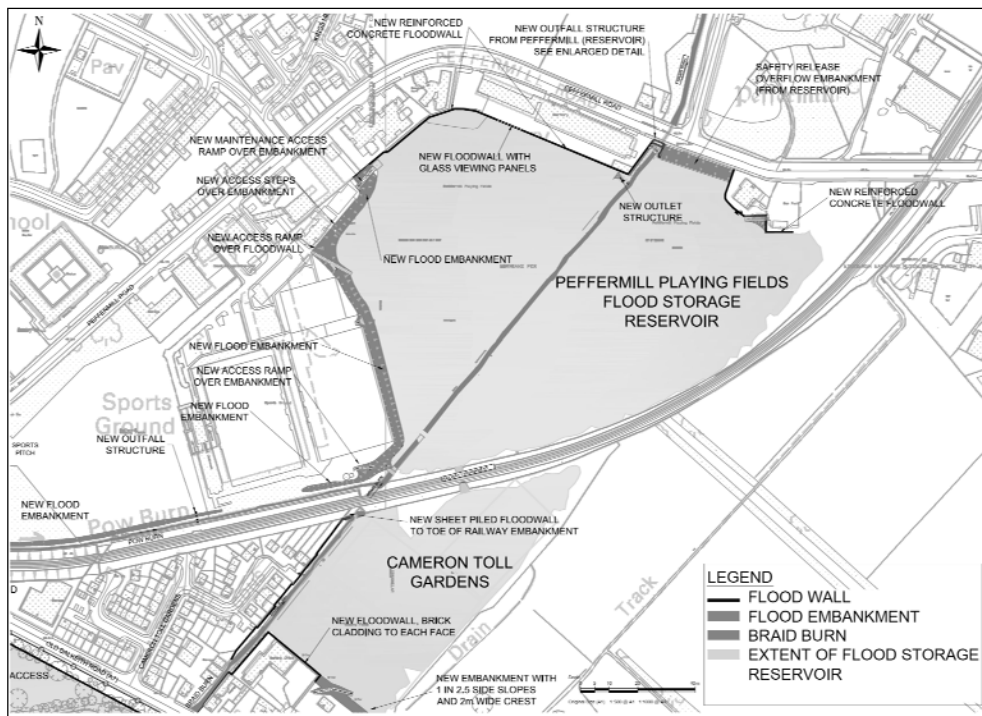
Peffermill Playing Fields Flood Storage Reservoir – Plan
